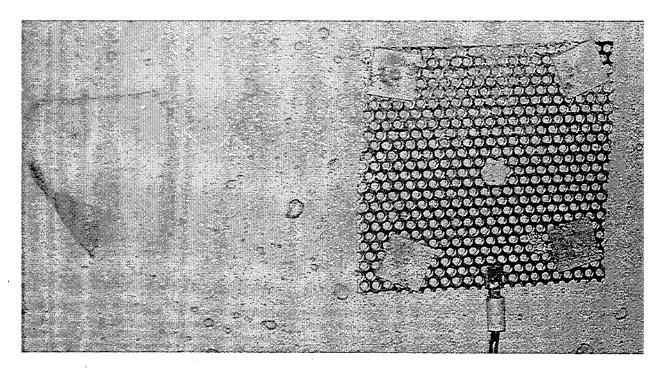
Expanded steel plate before second metallizing pass. Note loose tape on left.
